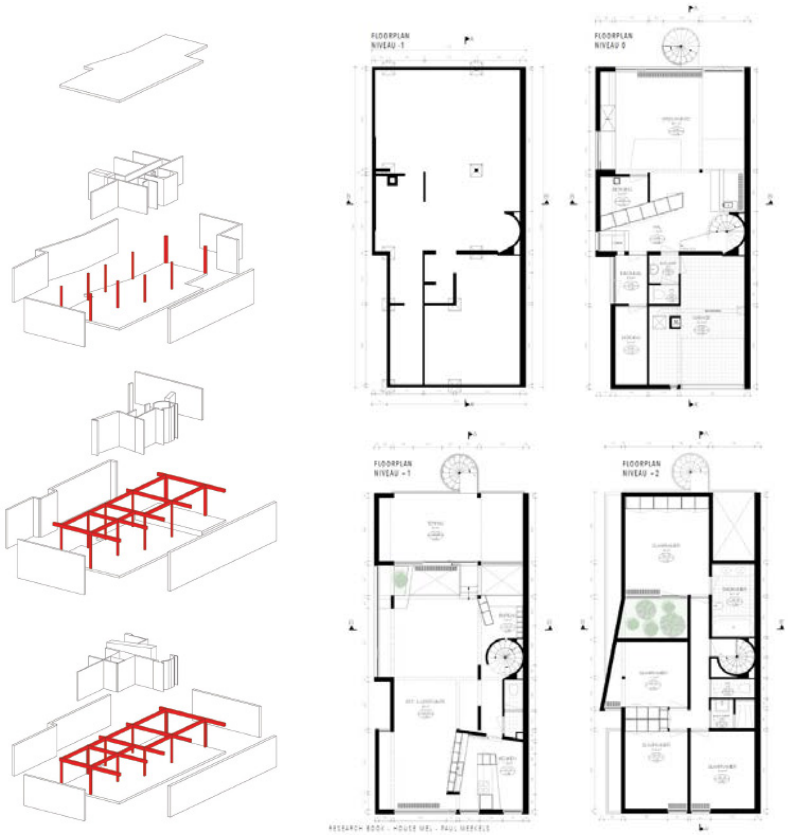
Identification of the loadbearing structure of House Mel. In white the brick masonry walls and in red the concrete structure.
